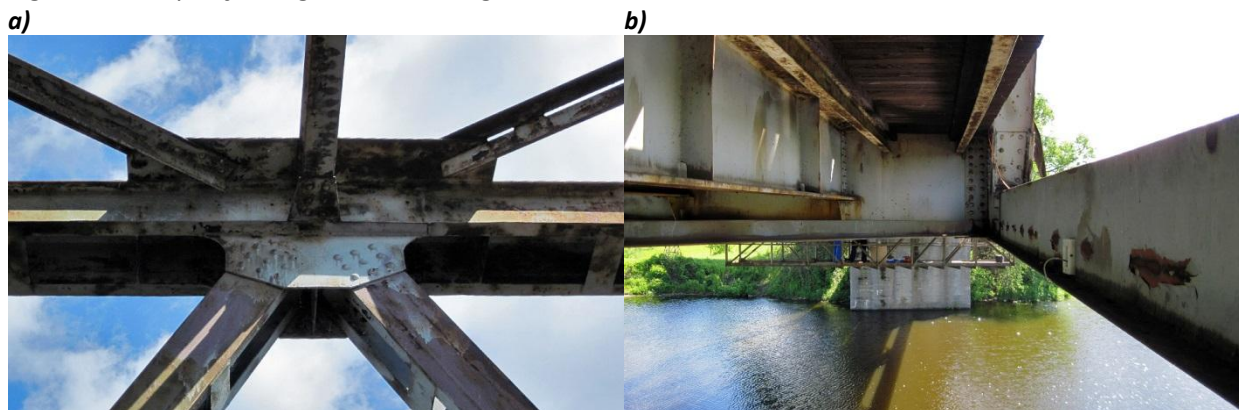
Nieporęt Bridge: (a) node point at the top of the truss and (b) stringer beam (on left)
